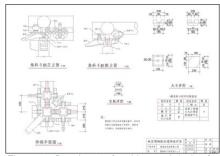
Drawing_4 of architectrual design for Jianfu Palace Garden
